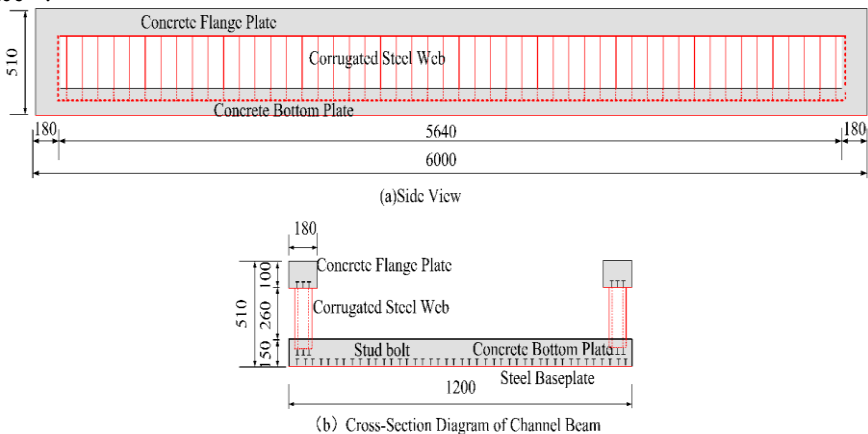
Cross-Section Dimensions and Construction Diagram of CSWTG
